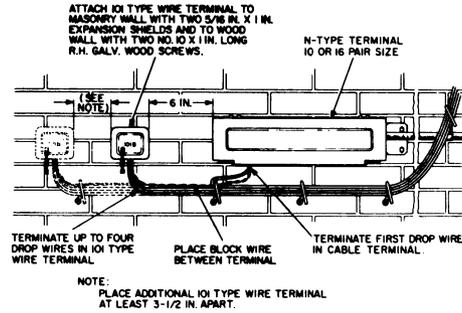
Wiring 101-Type Terminal With Horizontal Wall-Mounted Cable Terminal
